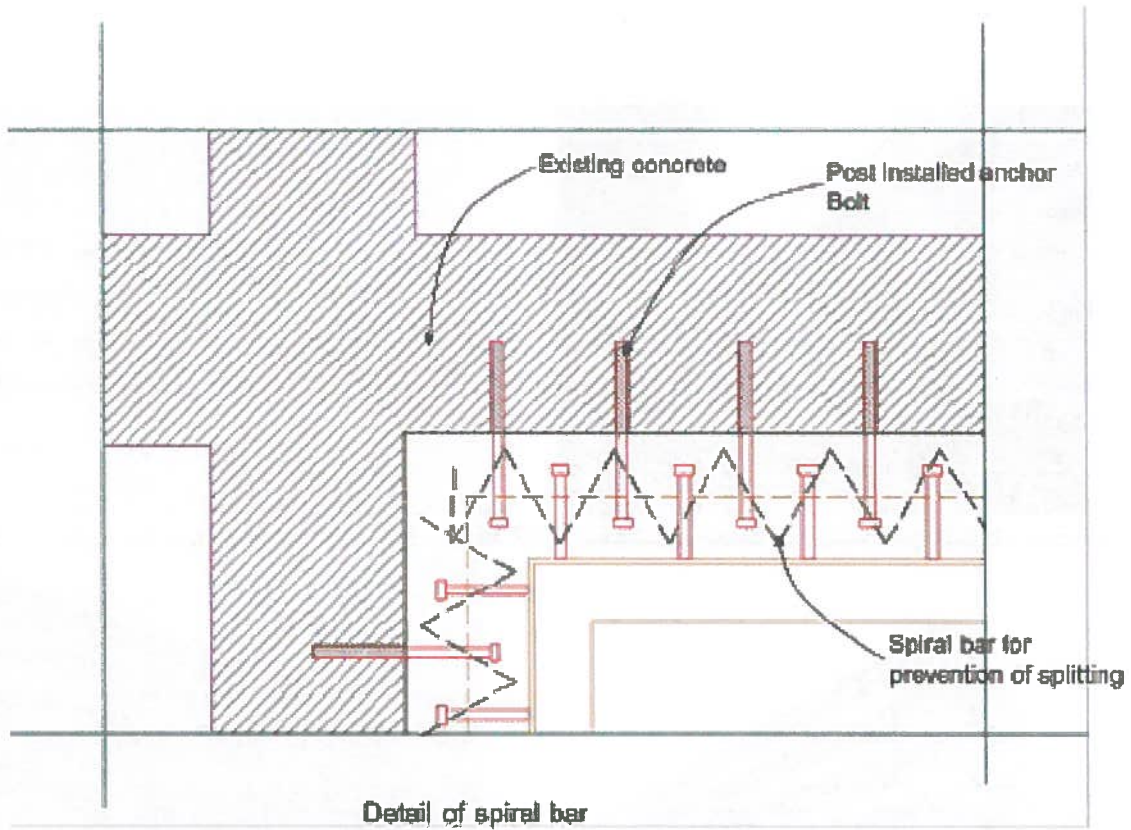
Details of Spiral Hoops to Prevent Split
